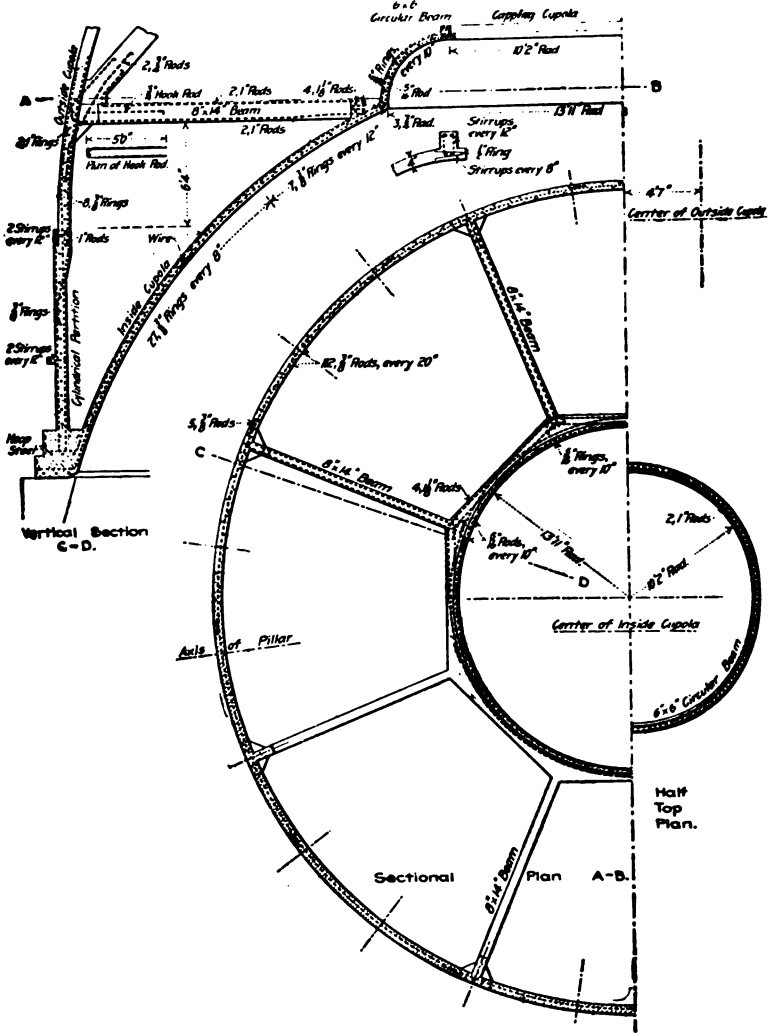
Plan and Section of Inner Dome, Naval Academy Chapel.
